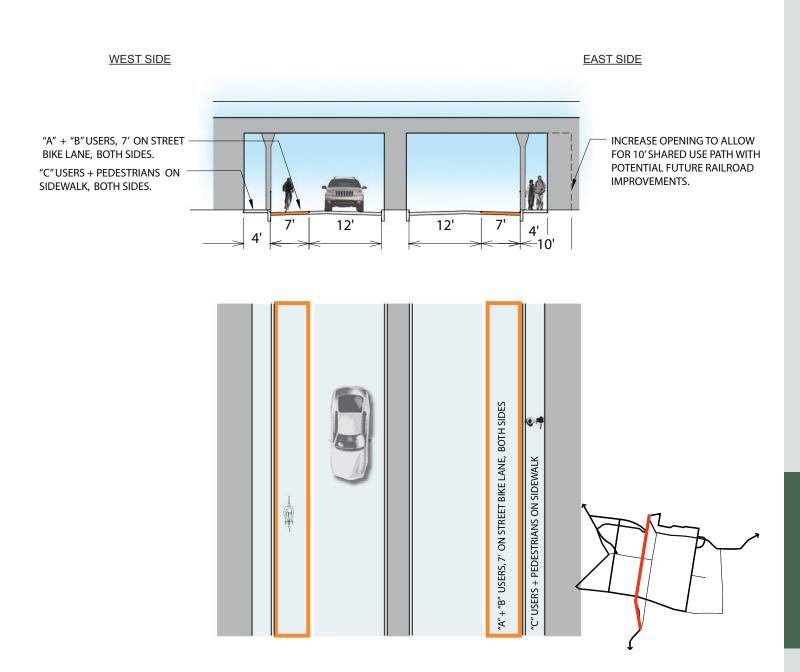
The Hub: Zone 1 4th Street & Viaduct Protytpical Treatment Cross-Section
